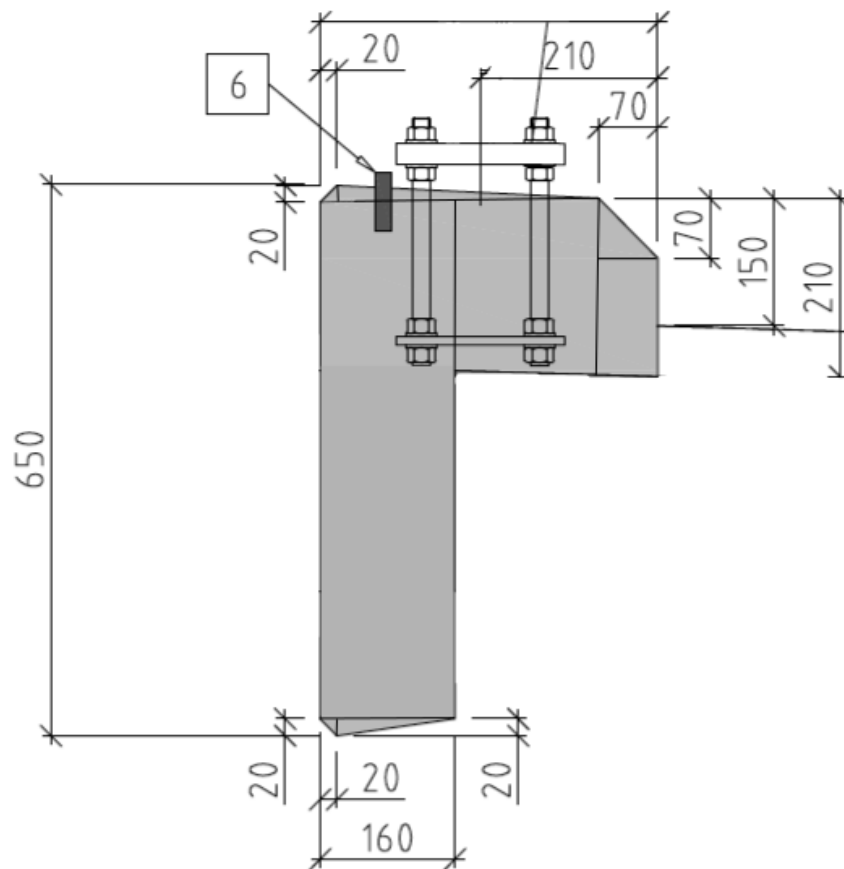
Model for calculating the cross sectional area of the edge beams at Sandsgård Bridge.
